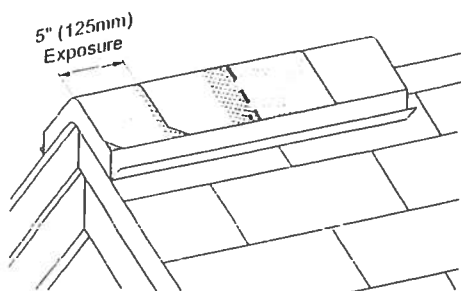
Install cap shingles at their correct exposure and cover all fasteners.
